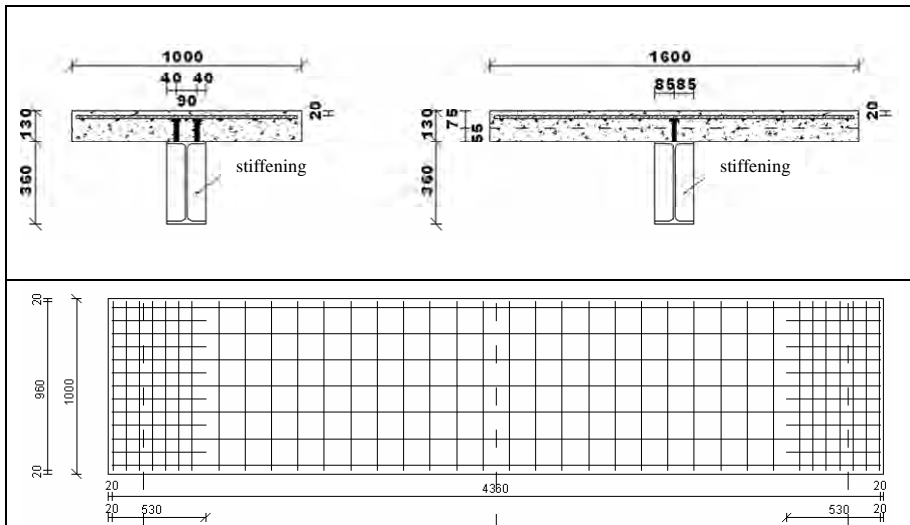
Beam layout: steel reinforcement of the slab with 100cm width.
